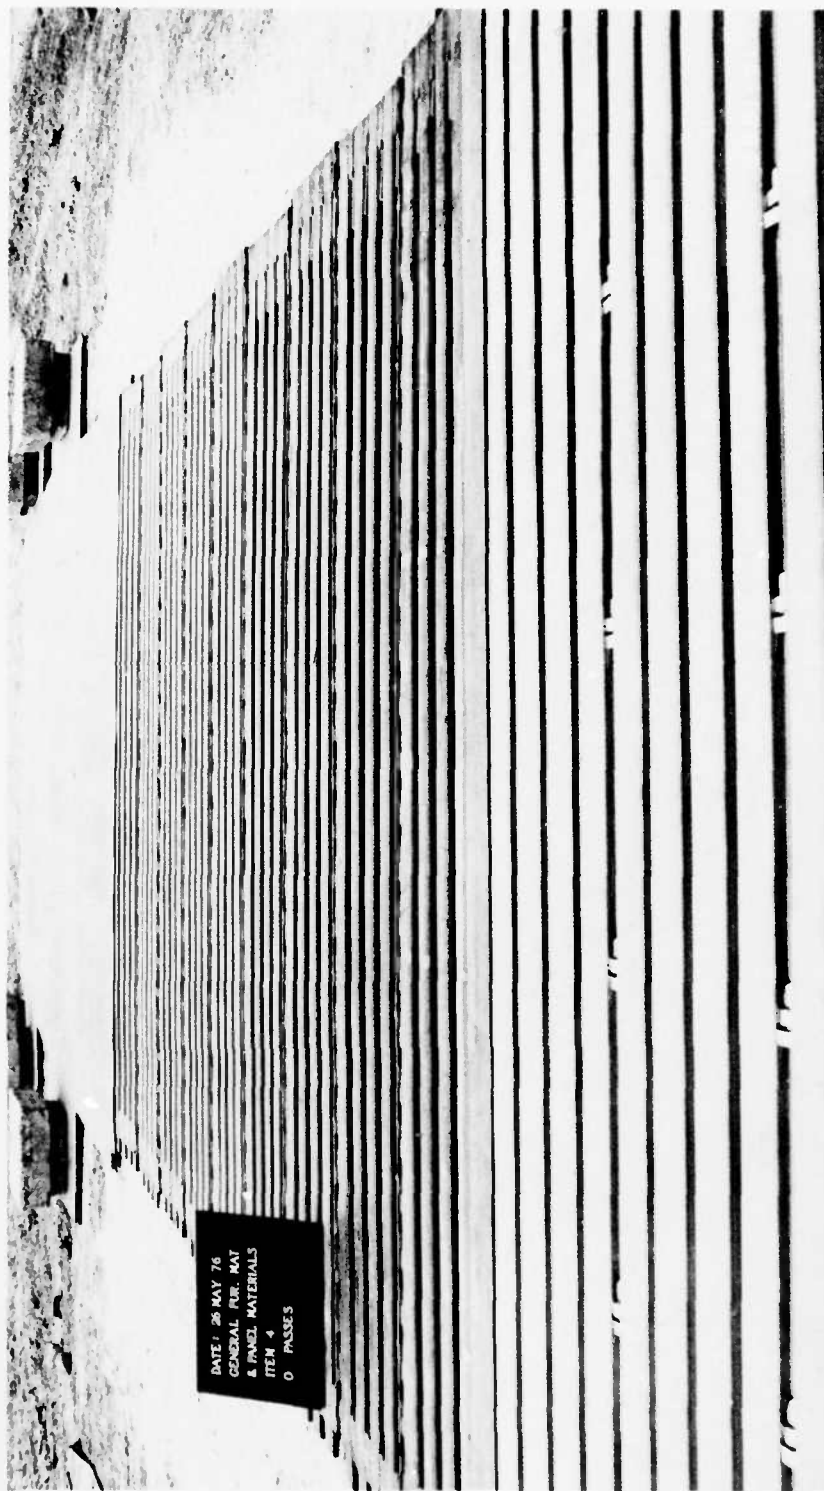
Item 4, test section 1; M8A1 panels prior to traffic
